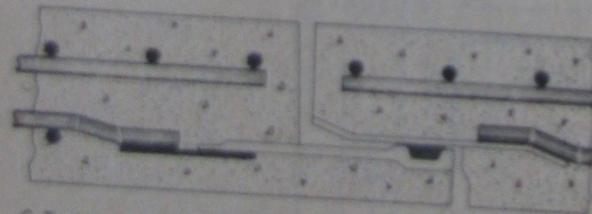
Typical concrete pipe joints. (Courtesy American Concrete Pipe Association.)
